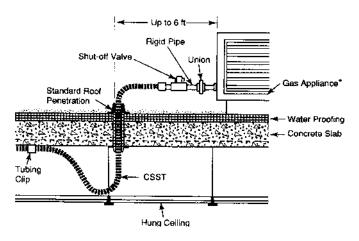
Short (1-6 foot) outdoor connection to roof mounted equipment
